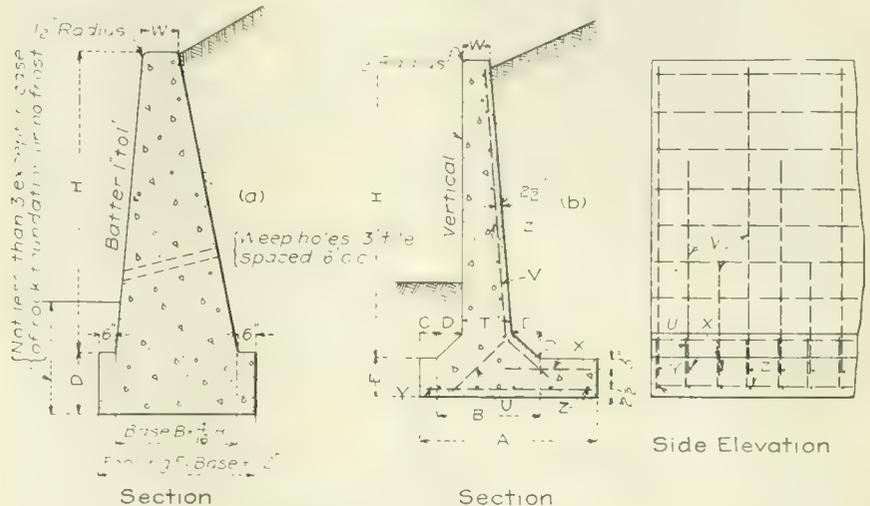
Standard Retaining Walls Used by Maine Highway Commission.
